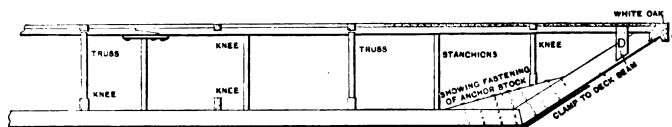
Longitudinal Section, Showing Deck Beams and Method of Securing
